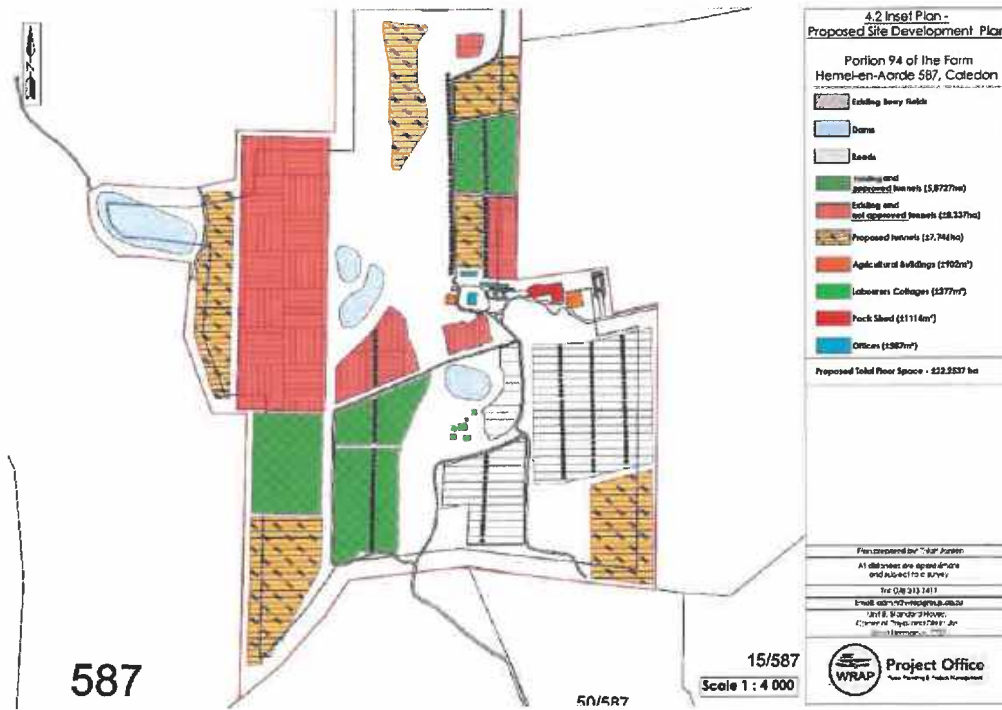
Proposed Site Development Plan: Highlighting the area and extent specifically for new tunnels.
